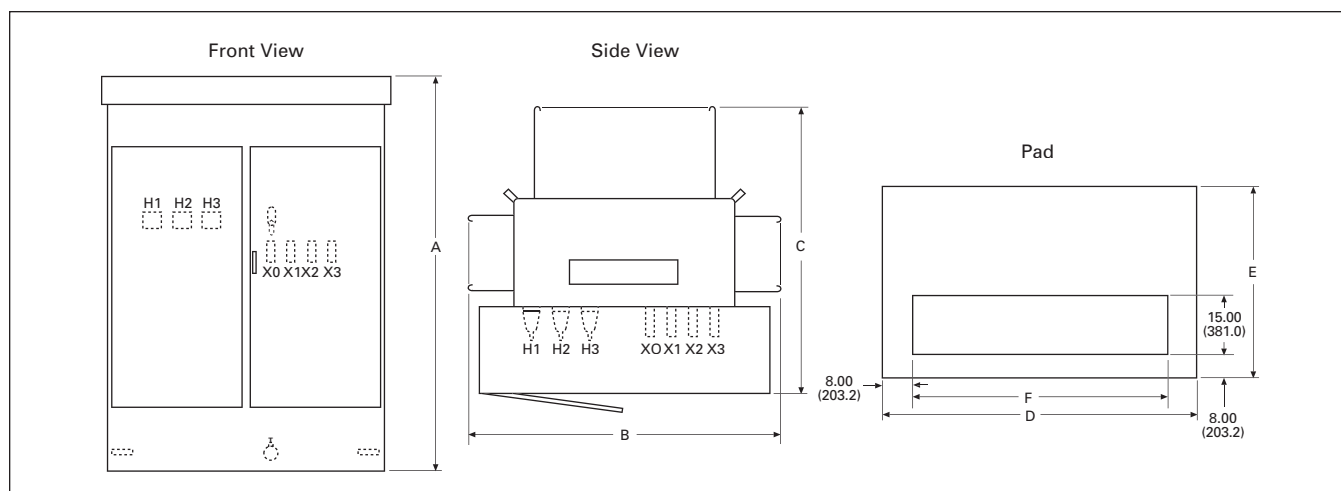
Pad-Mounted Transformer (3000–5000 kVA)—Dimensions in Inches (mm)
